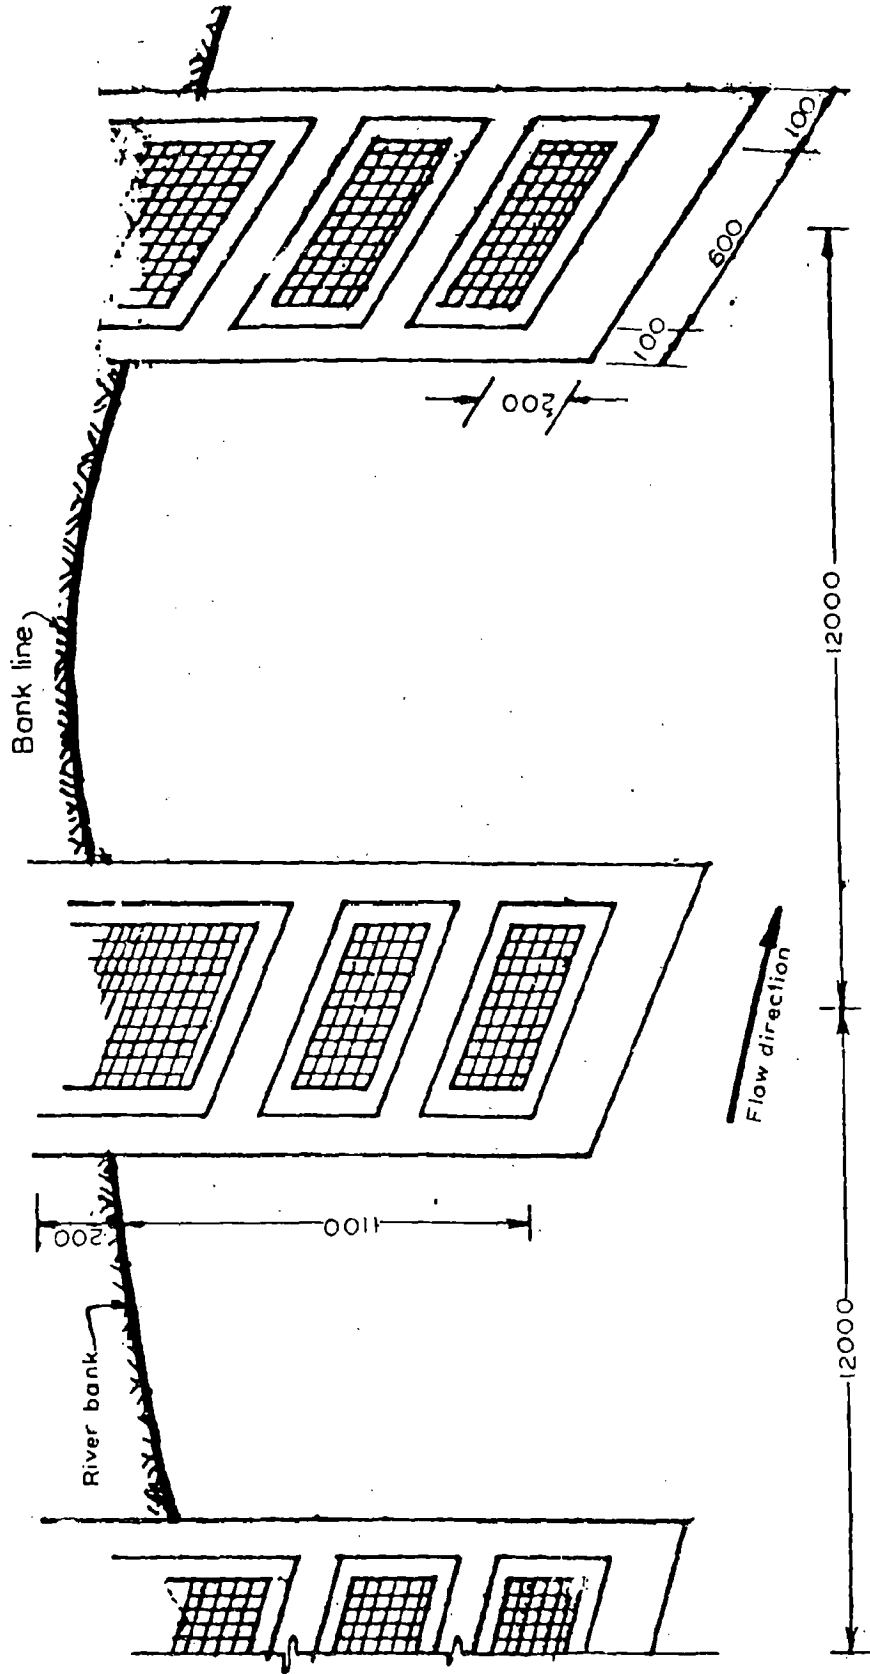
Sketch Plan of Slotted Spur General Layout
